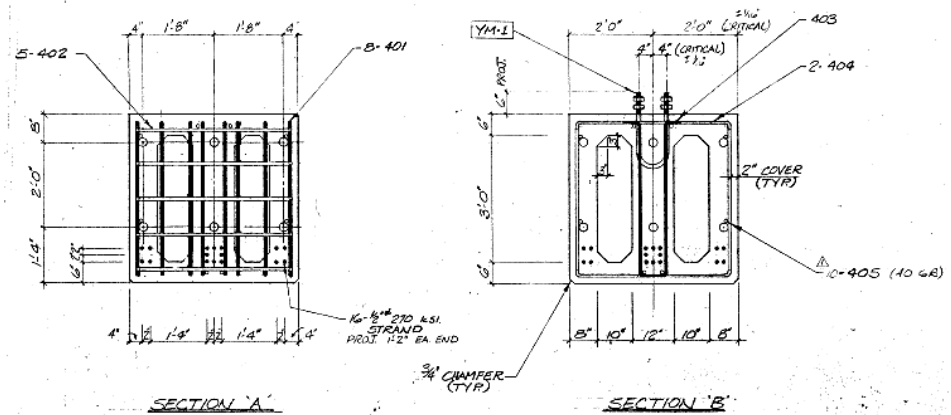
Rail Girder Rebar, Pre-Stressing Arrangement (Con-force DWG 0877-1)
